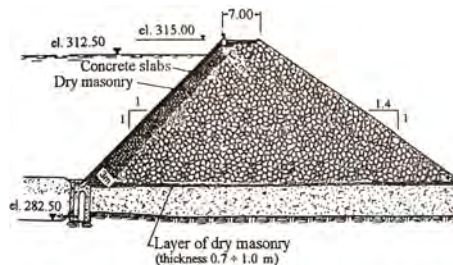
General cross section of Contrada Sabetta dam (modified after Cazzuffi 1987 and ICOLD 1991).
